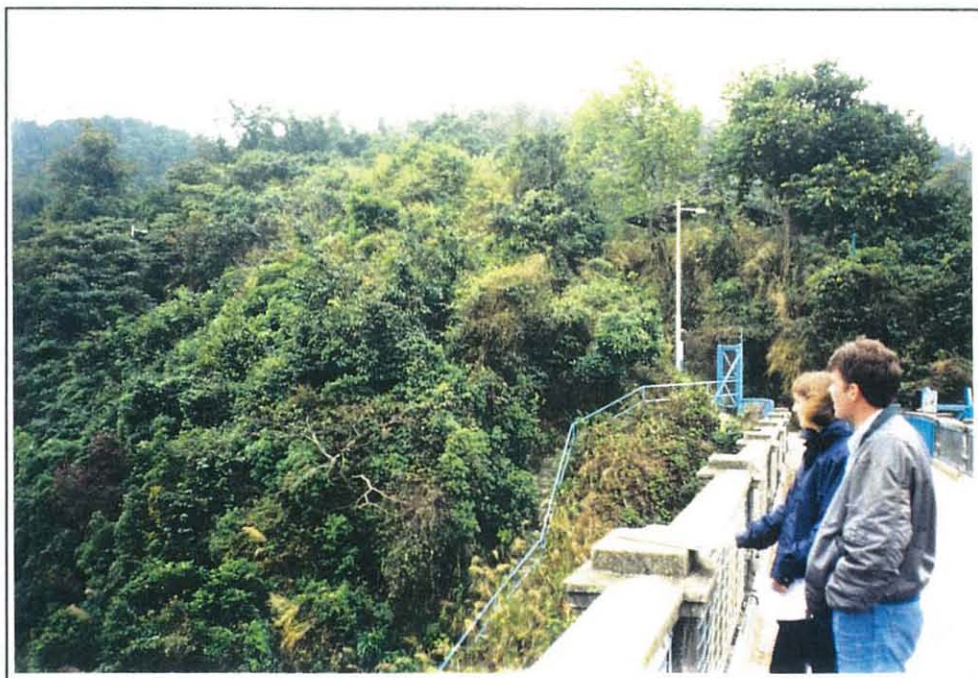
West end of Kowloon Byewash Reservoir Dam
